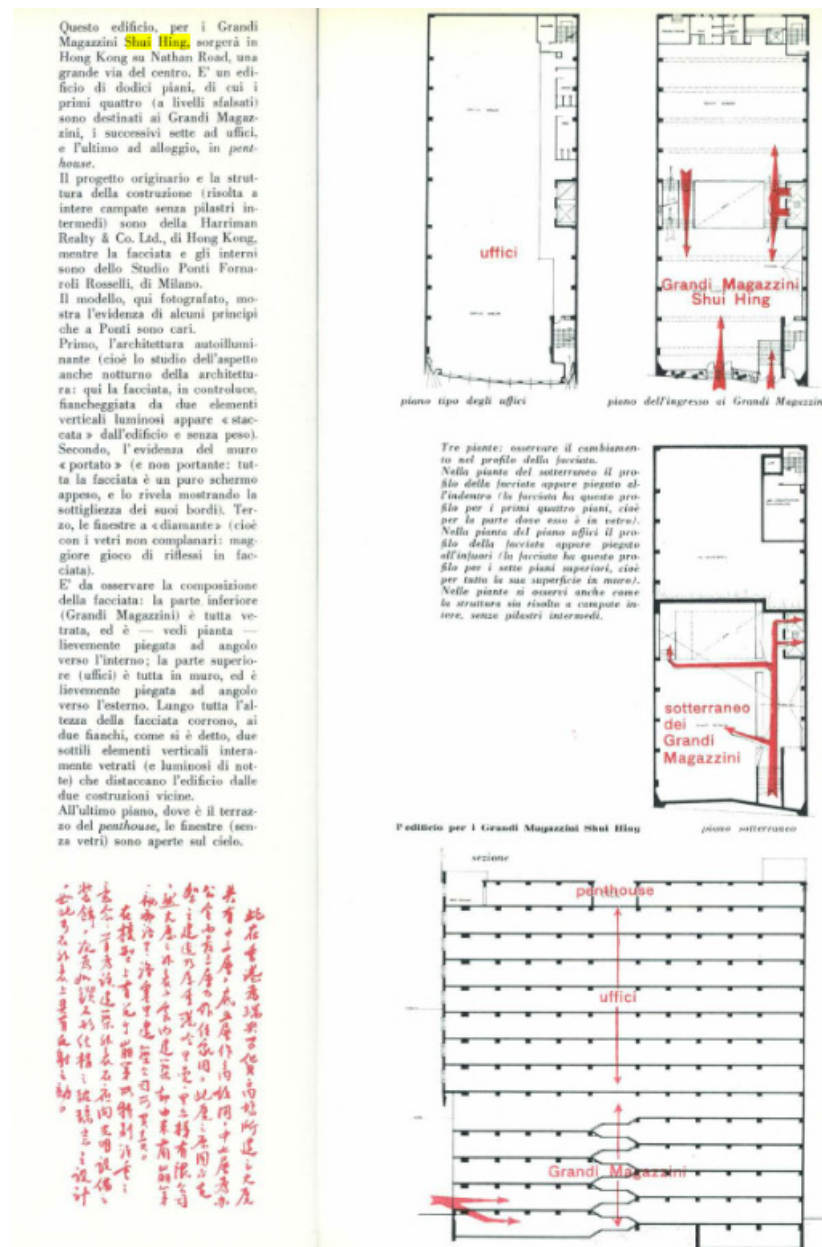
Top: Office Plan and Ground Floor Plan that have been drawn by Gio Ponti for Department Store.
